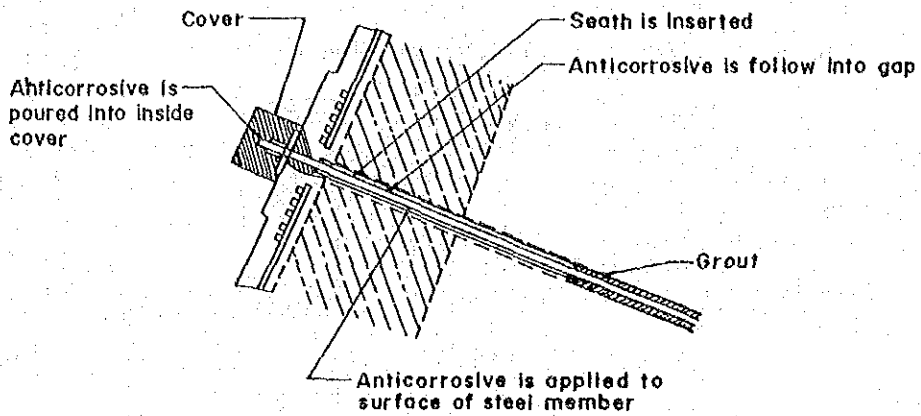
STRUCTURAL DETAIL OF PC-ANCHOR
